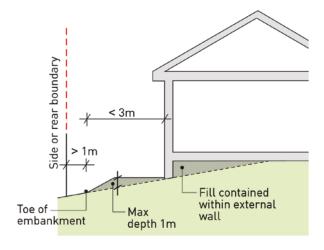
Fill to create a platform beside the dwelling house using an unprotected embankment
